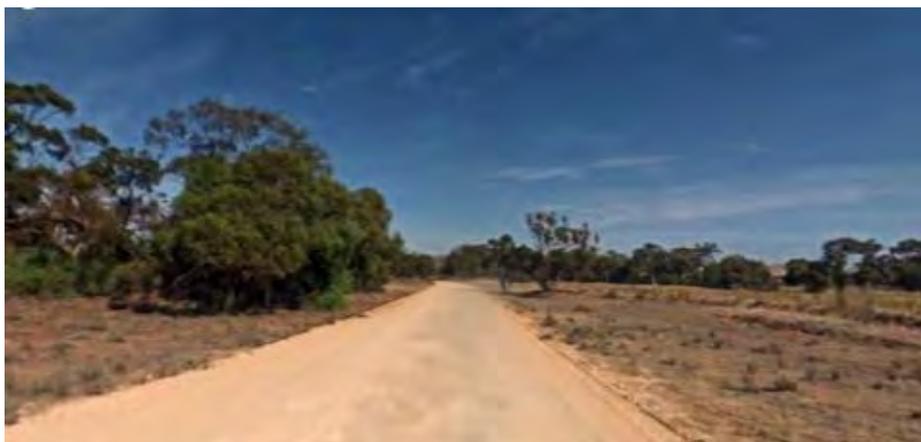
Typical Configuration of Minor Access Road (Bundilla Road)
